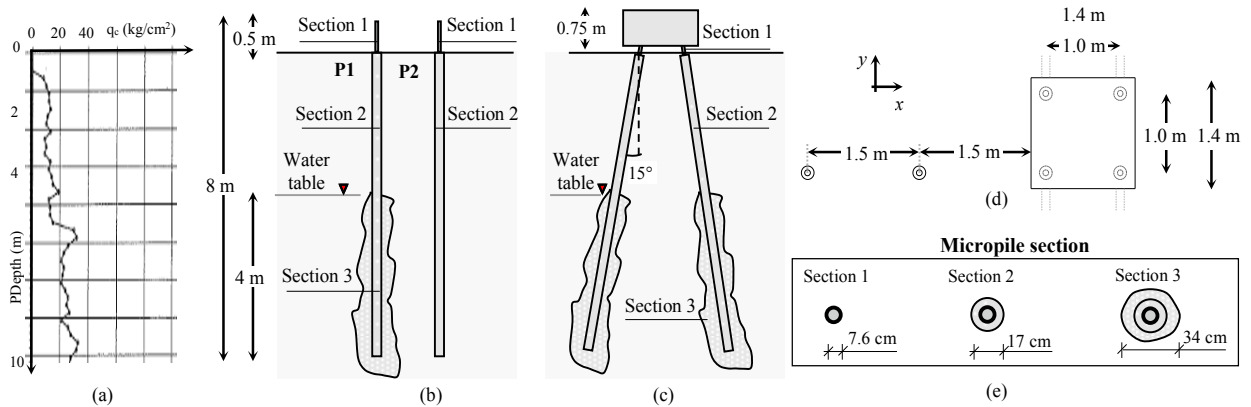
(a)  $q_c$  profile in the first soil layer; lateral view of (b) single micropiles and (c) group; (d) plan view of the field; (e) piles section.
